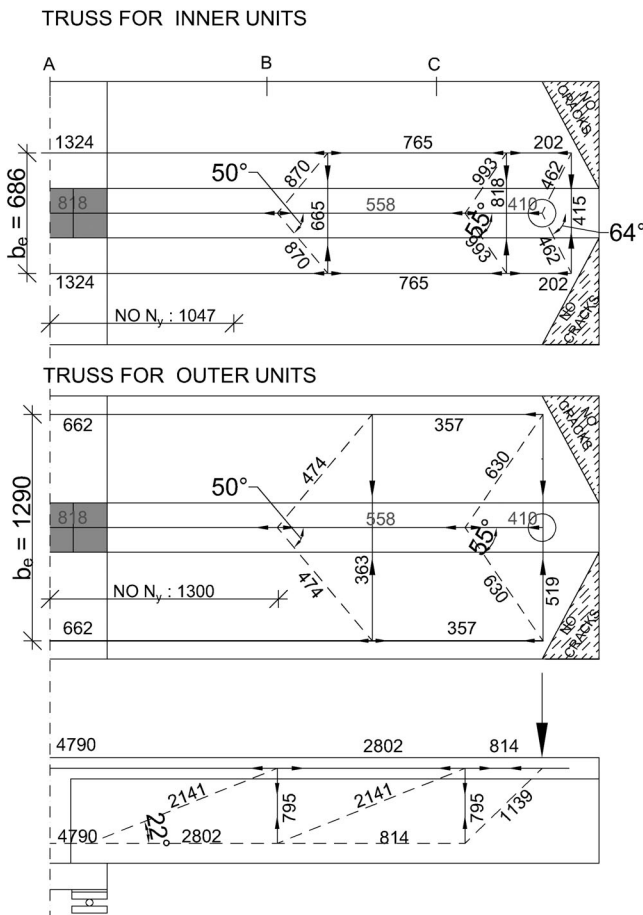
Truss model for tested tension flange of test beam 8. Longitudinal flange reinforcement outside the web treated as four units (inner and outer). Total N_y is the sum of inner and outer transversal forces
